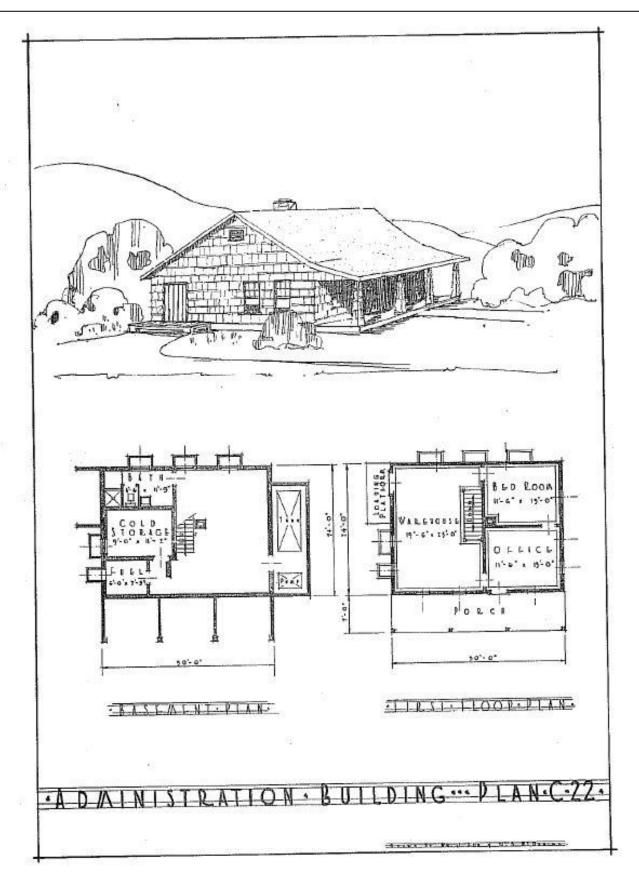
USFS suggested building plans for administration buildings (Fickes, 1935: 567).
